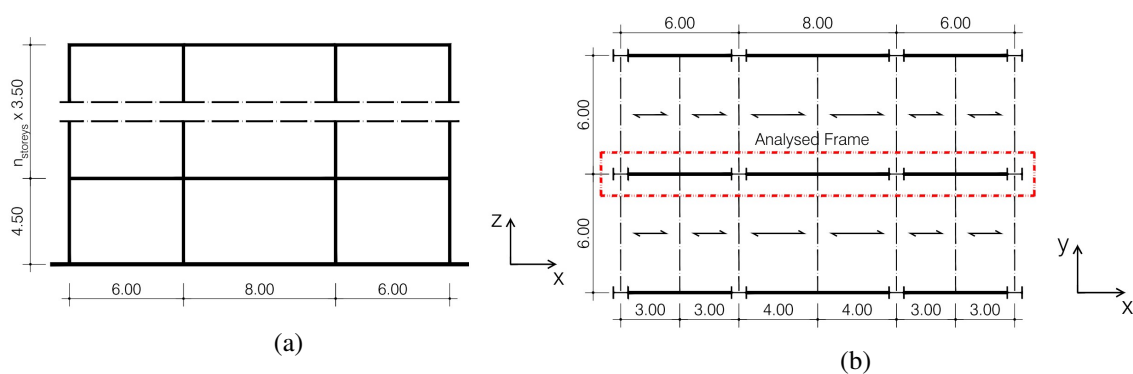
Building configuration 2: a) Elevation view, b) Plan view.
